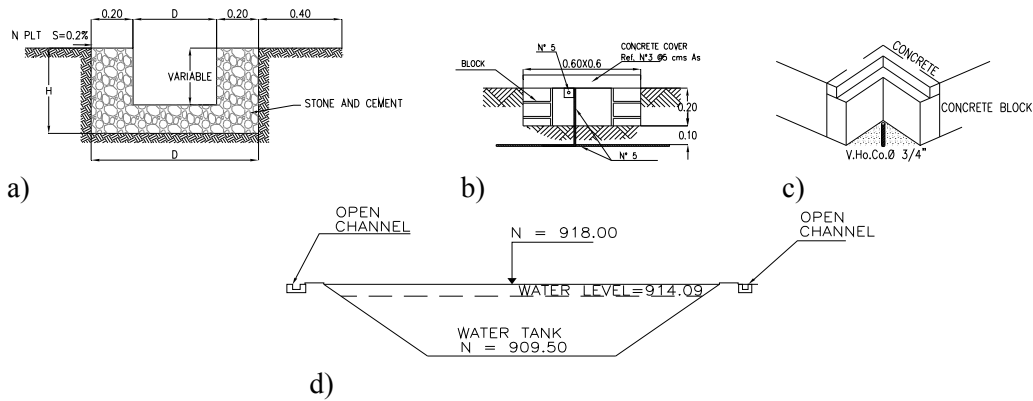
a) Rainwater channel, b) Cross-section of pole under ground, c) Pole under ground, and d) Water tank
